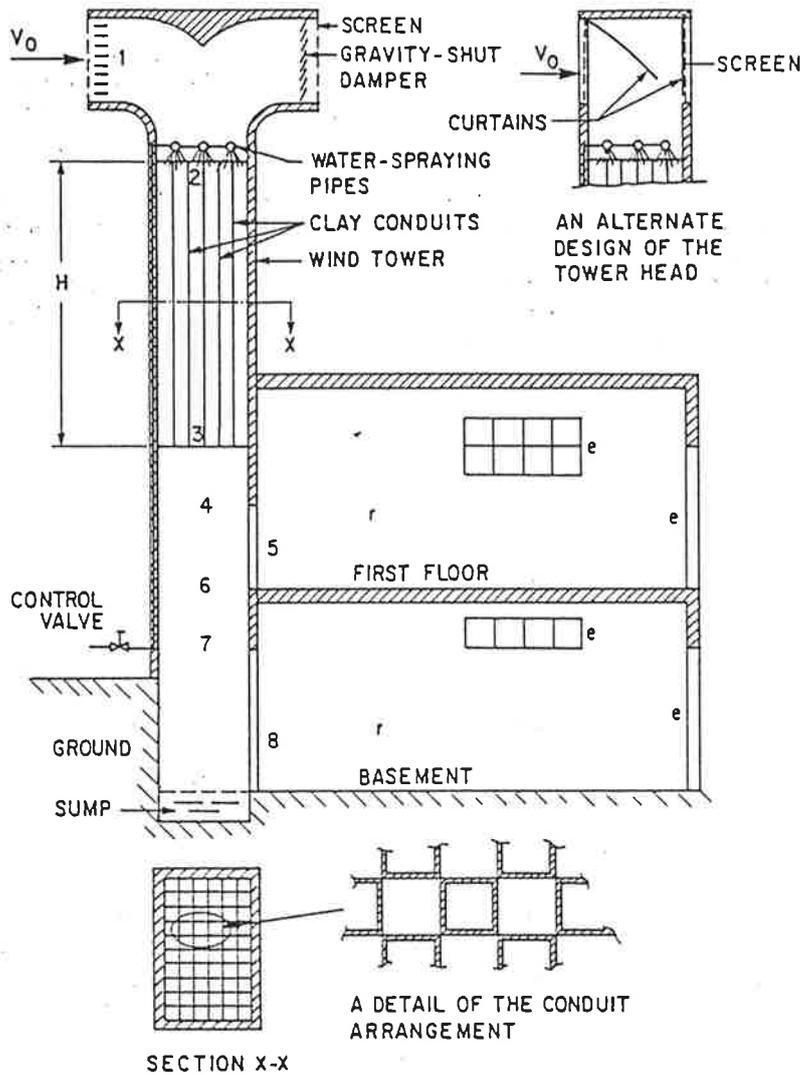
A cross-section of the proposed design of the wind tower or Baud-Geer.
